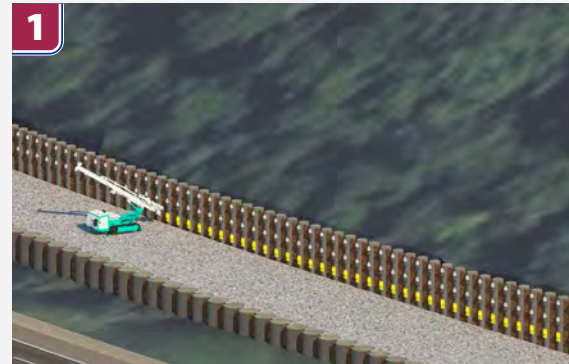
| Working on landslide prone slopes and construction of the I-405 NB to SR 522 Bridge over Sammamish River
